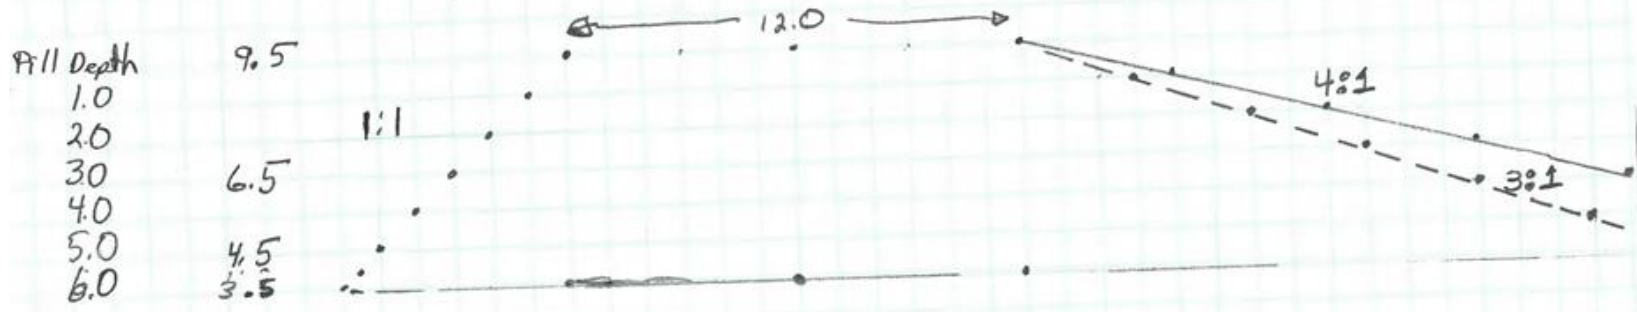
Unit 1 S. Canal S.E. pasture access bridge cross-section drawing.
